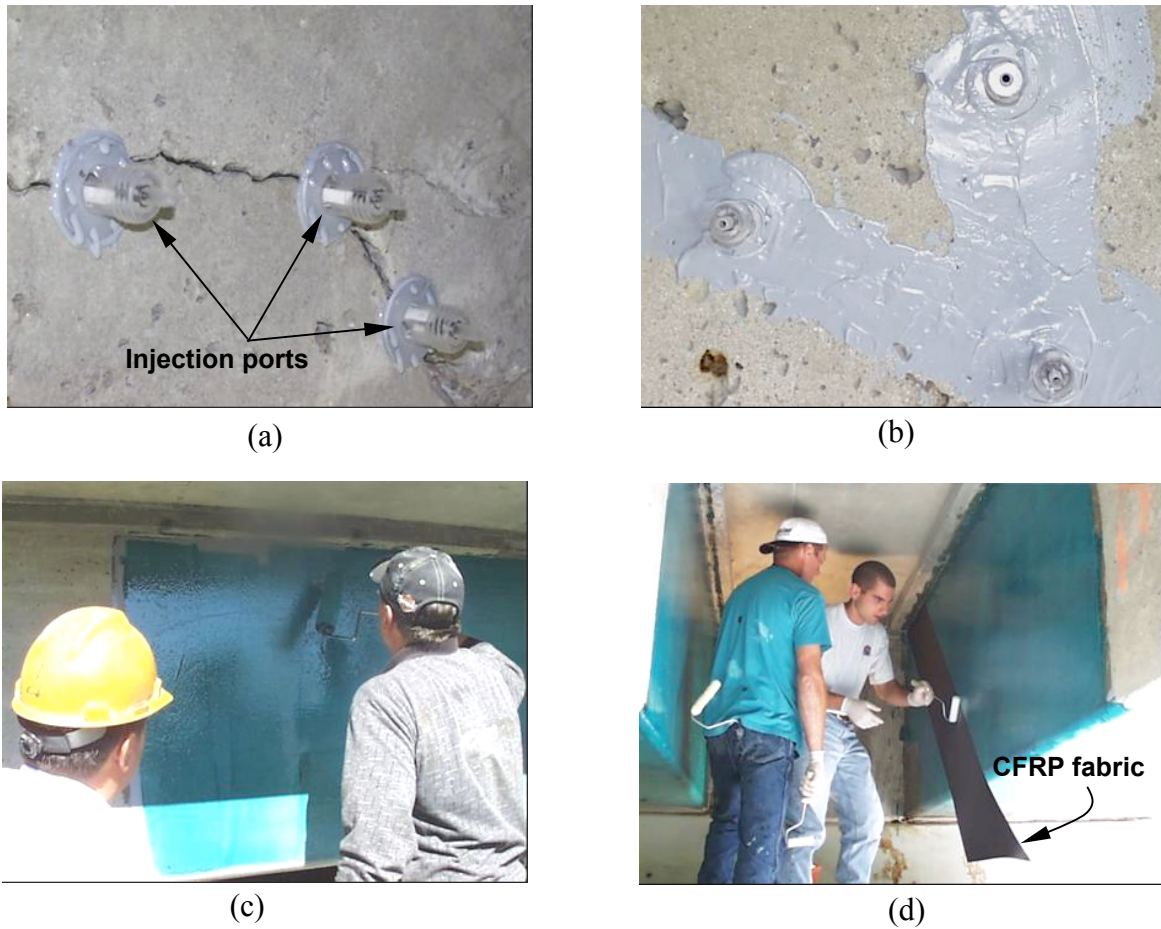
Retrofitting of concrete box-beams in the Carter County bridge: (a) mounting of injection ports in cracks; (b) sealing cracks using epoxy; (c) applying two-part resin; and (d) attaching CFRP fabric to concrete
